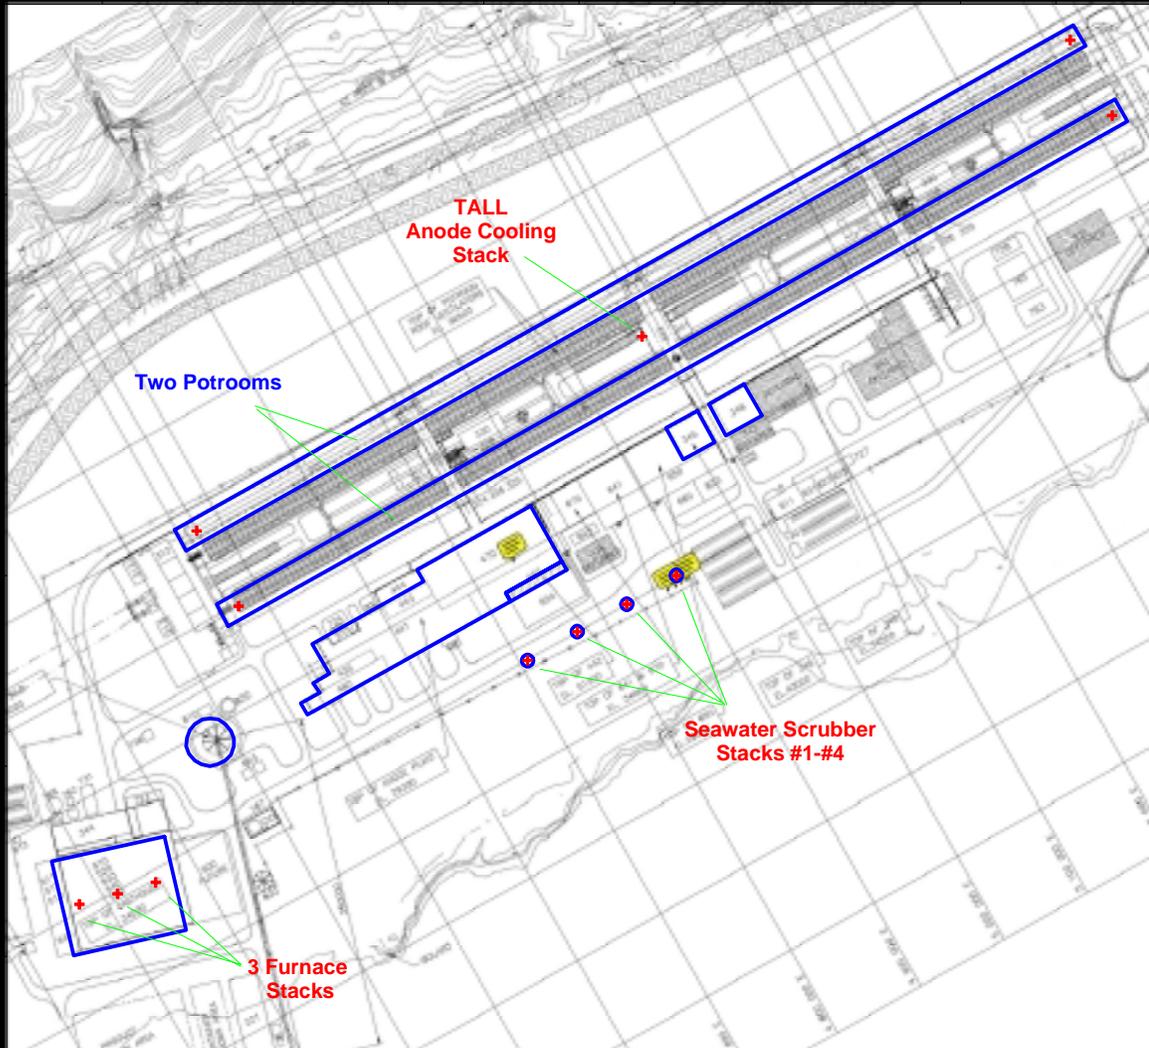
Plan of the Alcoa facility showing building locations and the emission sources. Note that the location of the potrooms was extracted from a separate more detailed map.
